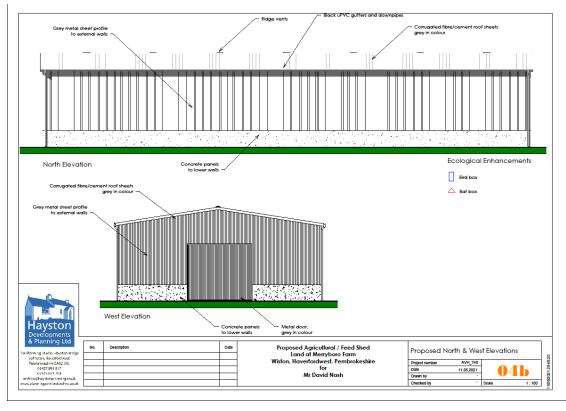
Proposed north and west elevation of agricultural shed. Plan supplied by client.
